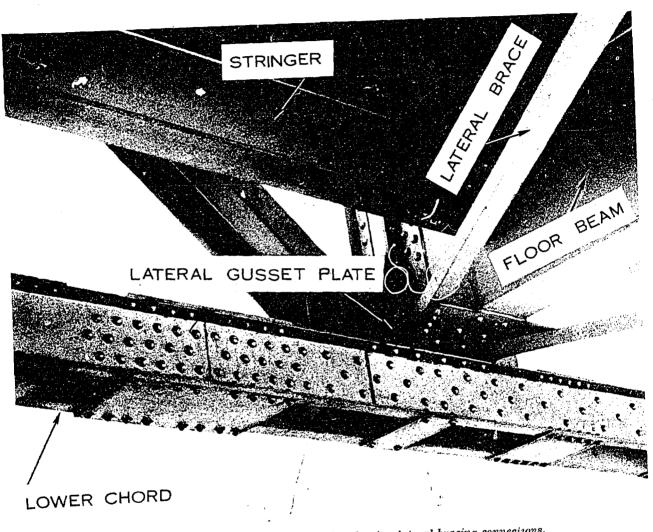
Lower chord panel point showing lateral bracing connections.
